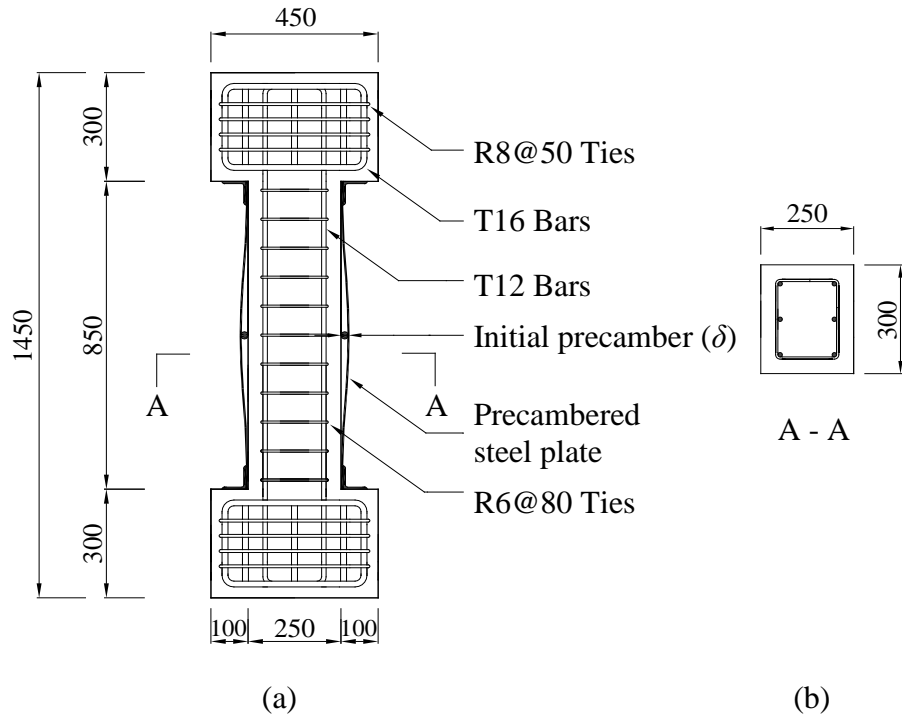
The specimen configuration: (a) Elevation; (b) Cross section
